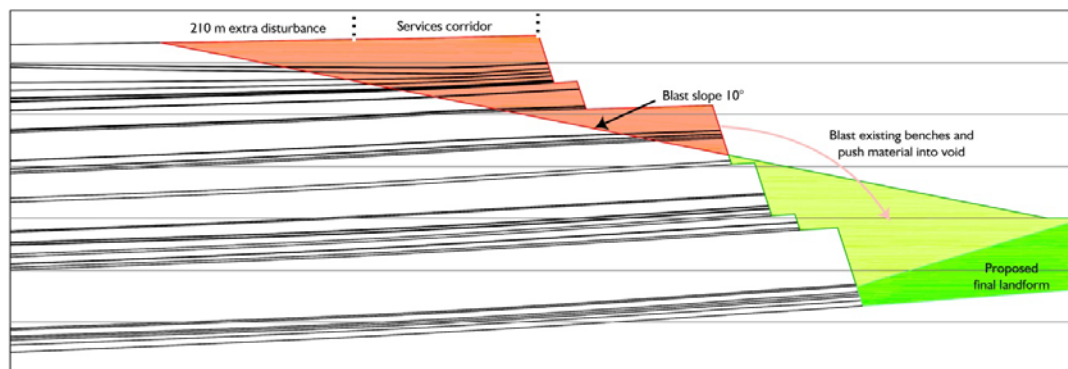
Representative cross-section of final highwall in North Pit showing minimal blasting of benches to achieve a shallower final void slope
